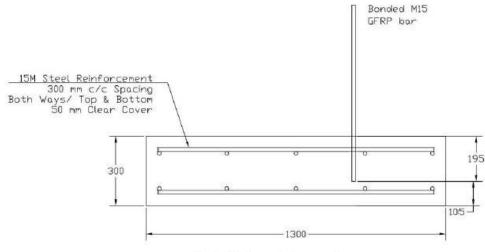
Group 1 - Straight fully-bonded GFRP bar in concrete
